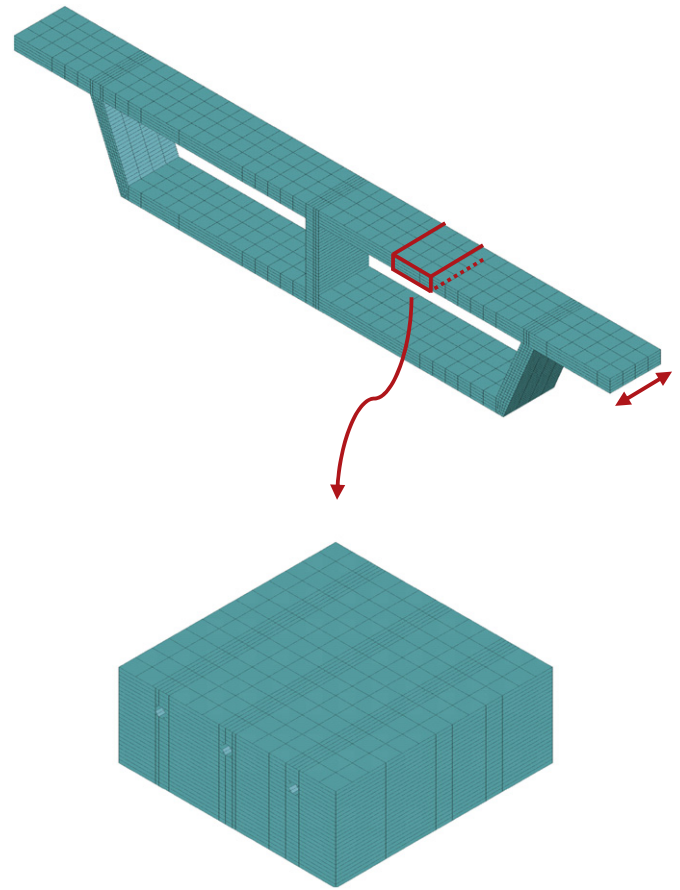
Three-dimensional finite-element model of a typical reinforced concrete member (unit length).
